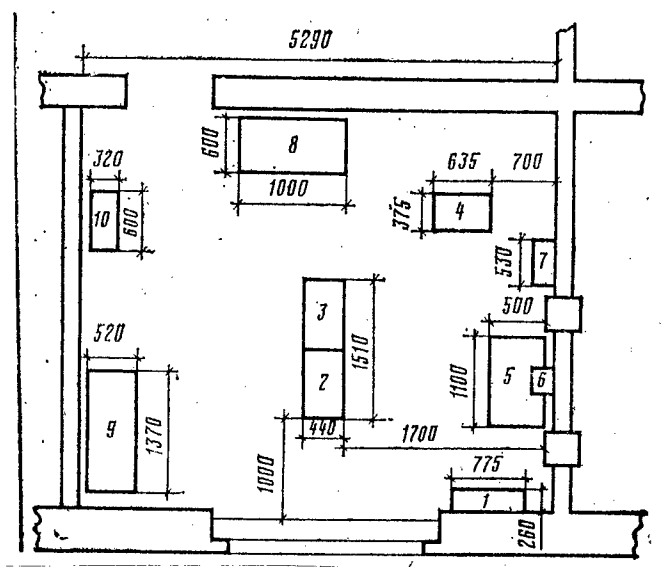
Plan for the equipment layout of an ATS K-40/80 80 number central exchange.
